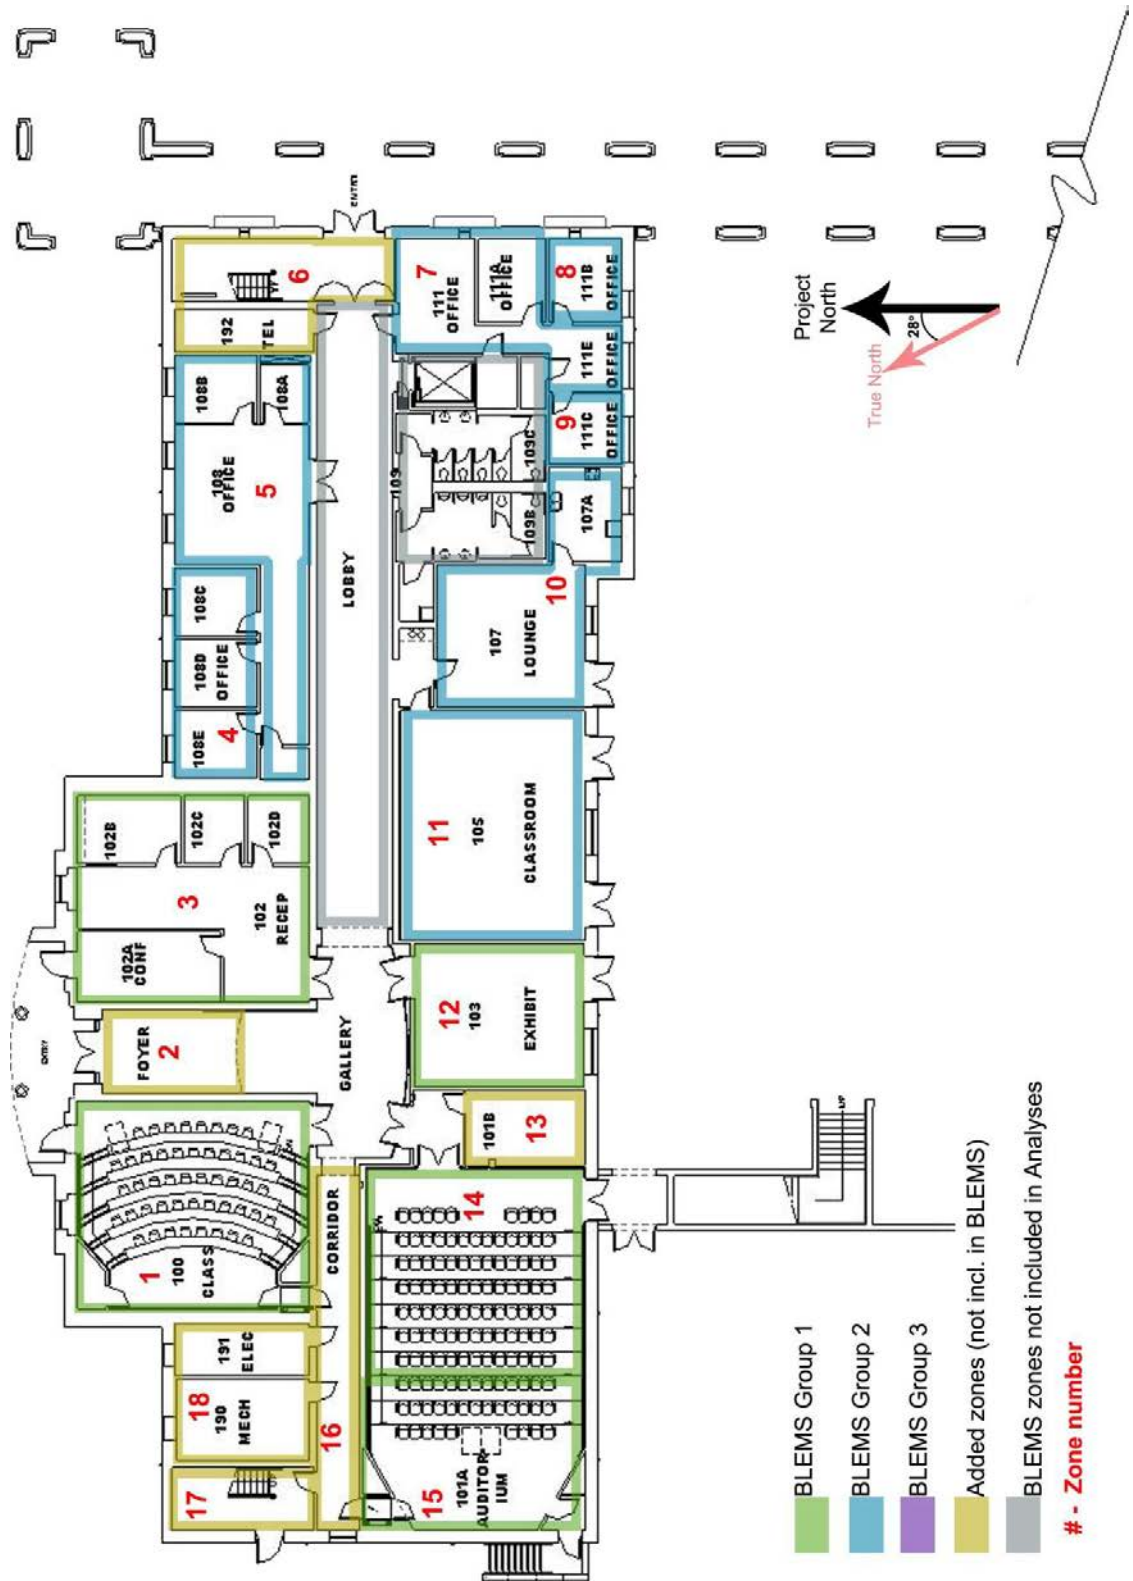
Lewis hall floor plan with BLEMS zones: First Floor
